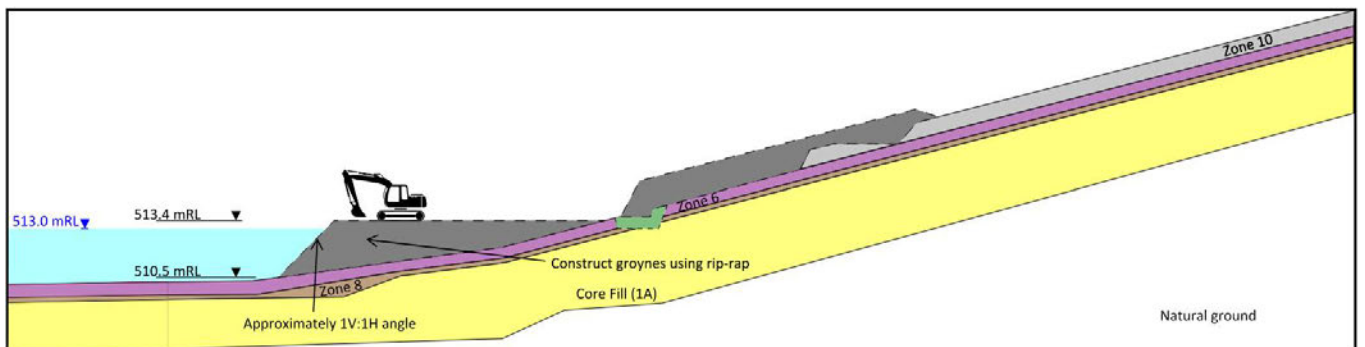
Schematic sketch – Tranche 2 – abutments – construction of groynes
